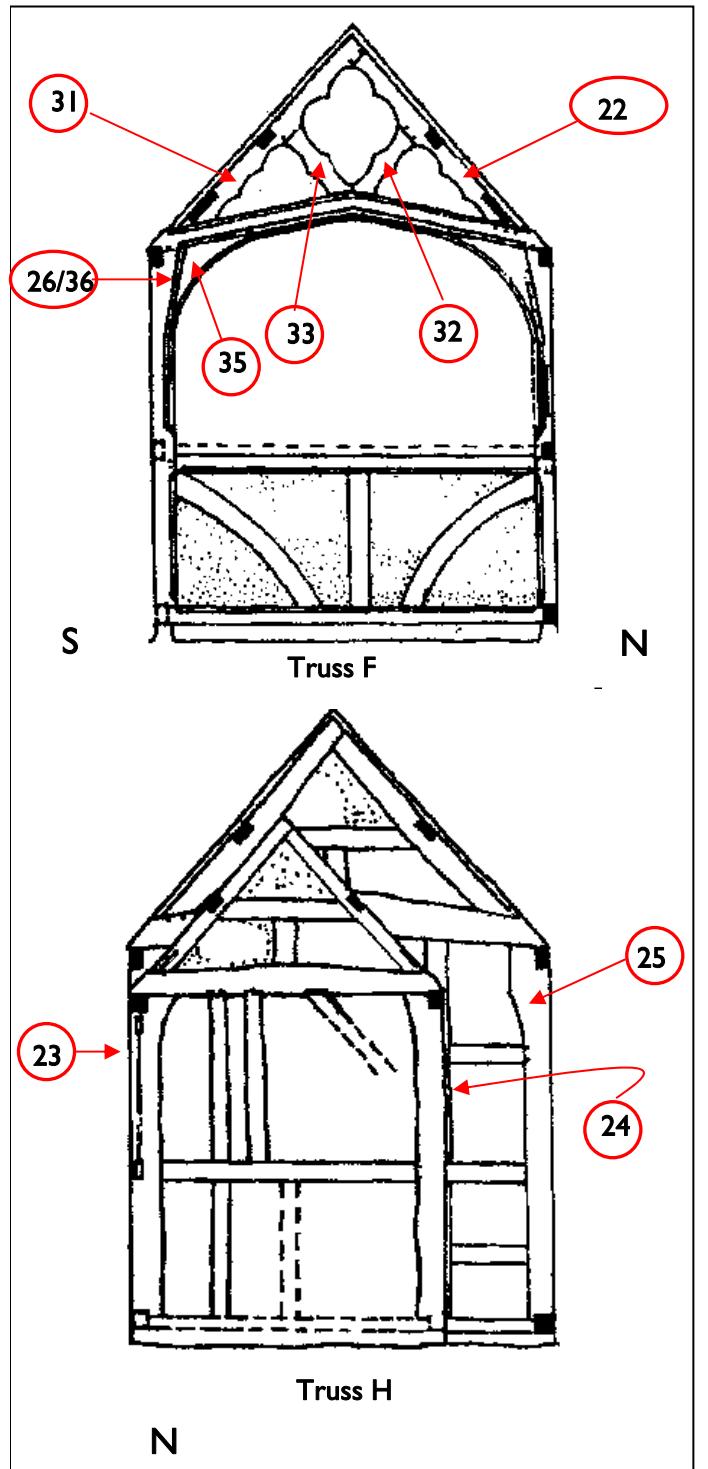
North cross-wing trusses (solar) to show timbers sampled (after Jones 1975–76)
